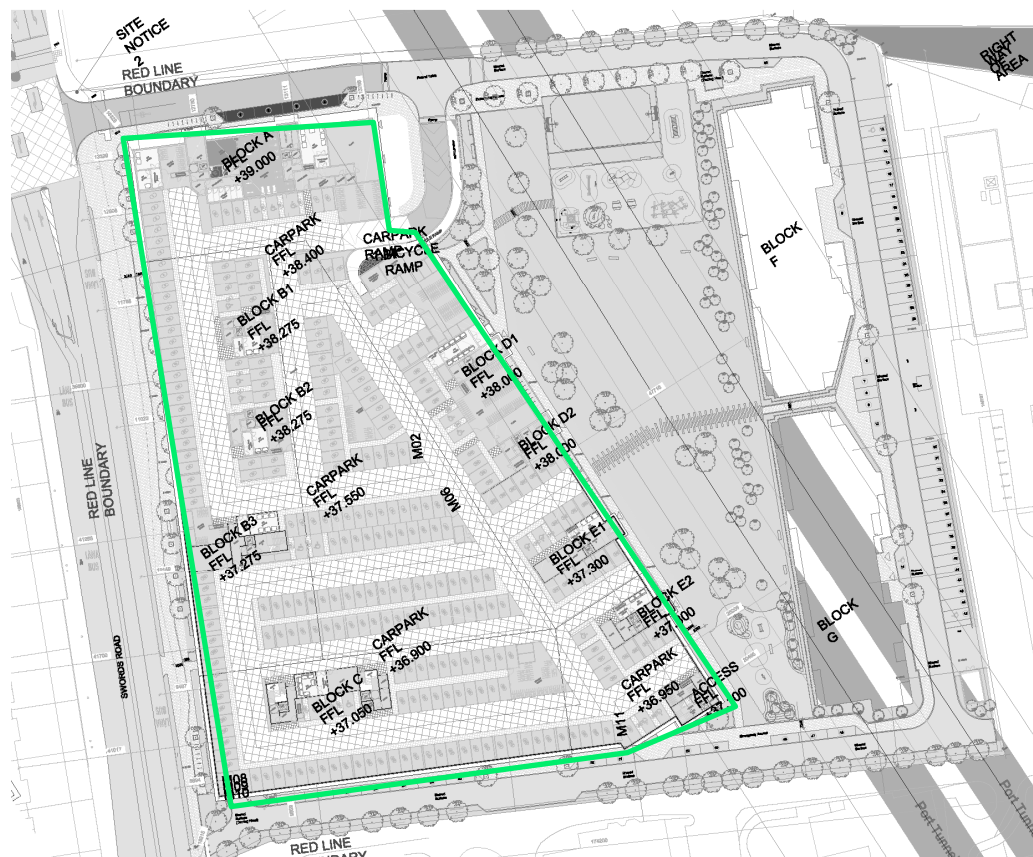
Finished Floor levels for basement proposed below Blocks A to E
